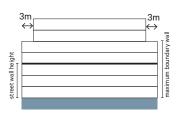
Diagram demonstrates the relationship between height, street wall height, boundary wall and building separation (6-10 storeys)
